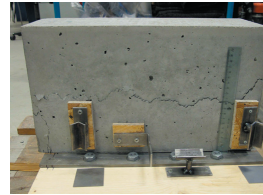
Picture of the failure in the concrete (Test series S-8S-65)
